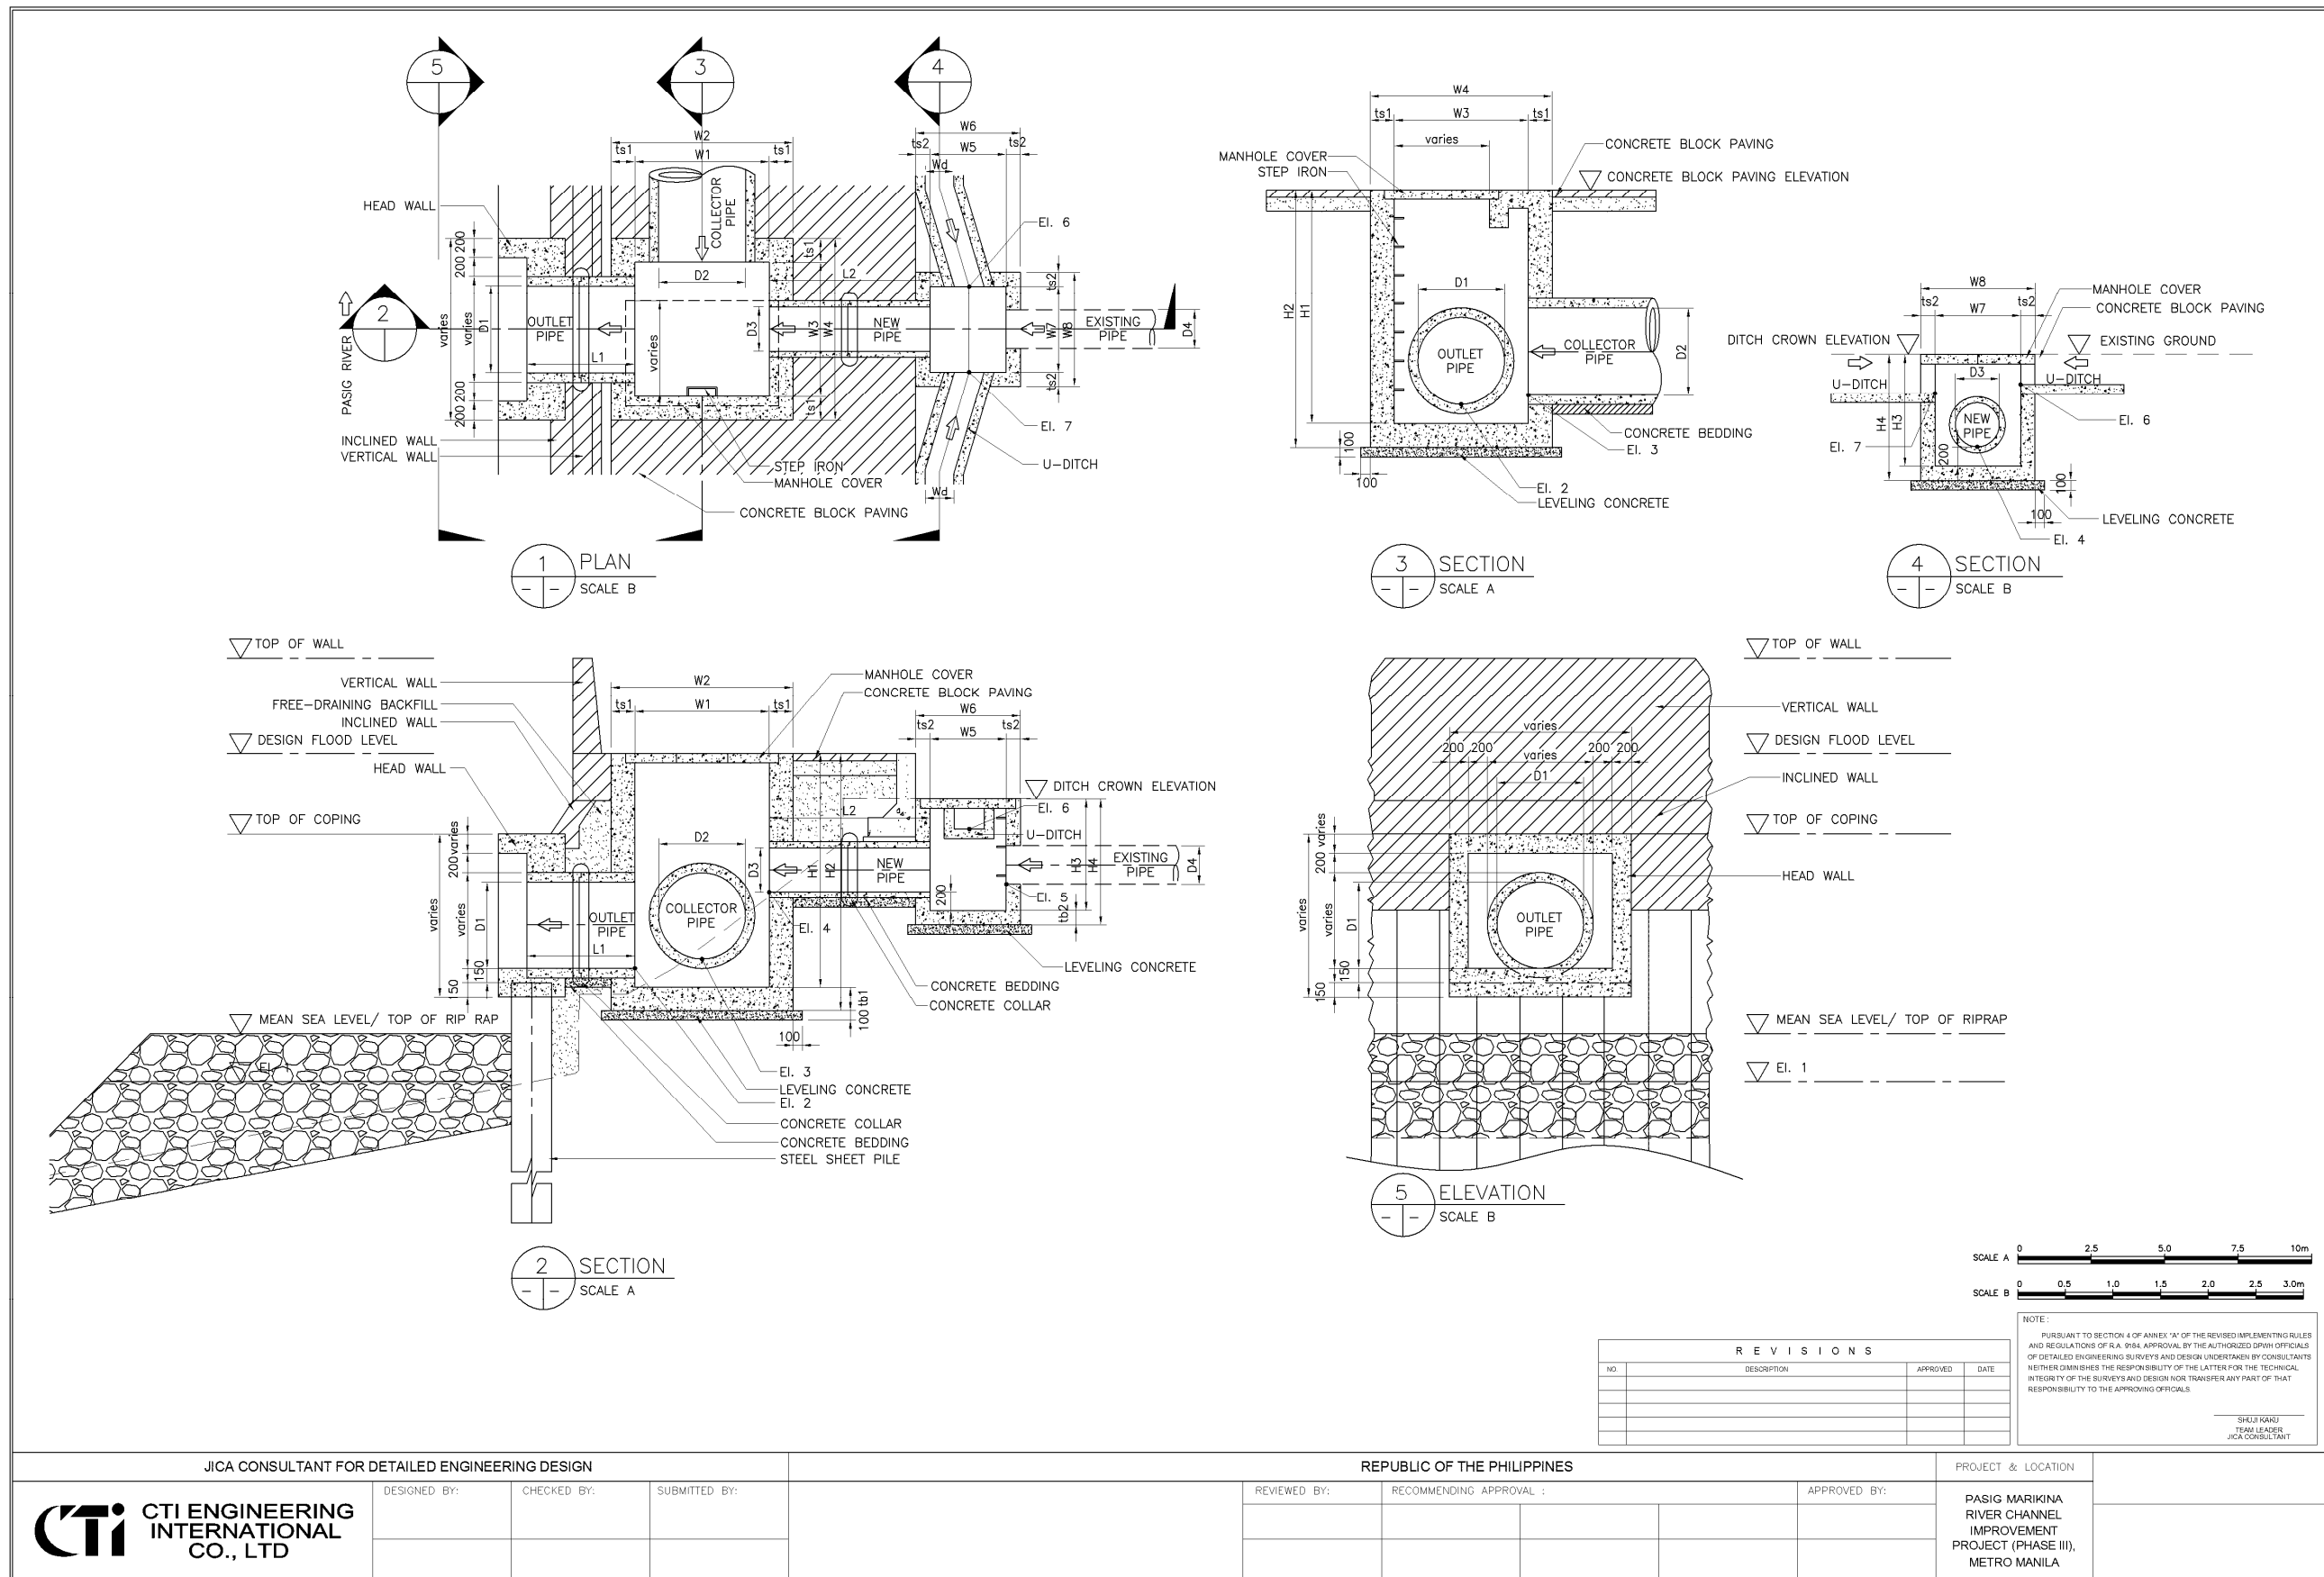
Typical Drawing of Drainage Facility in Pasig River (1/2) (2/2)
